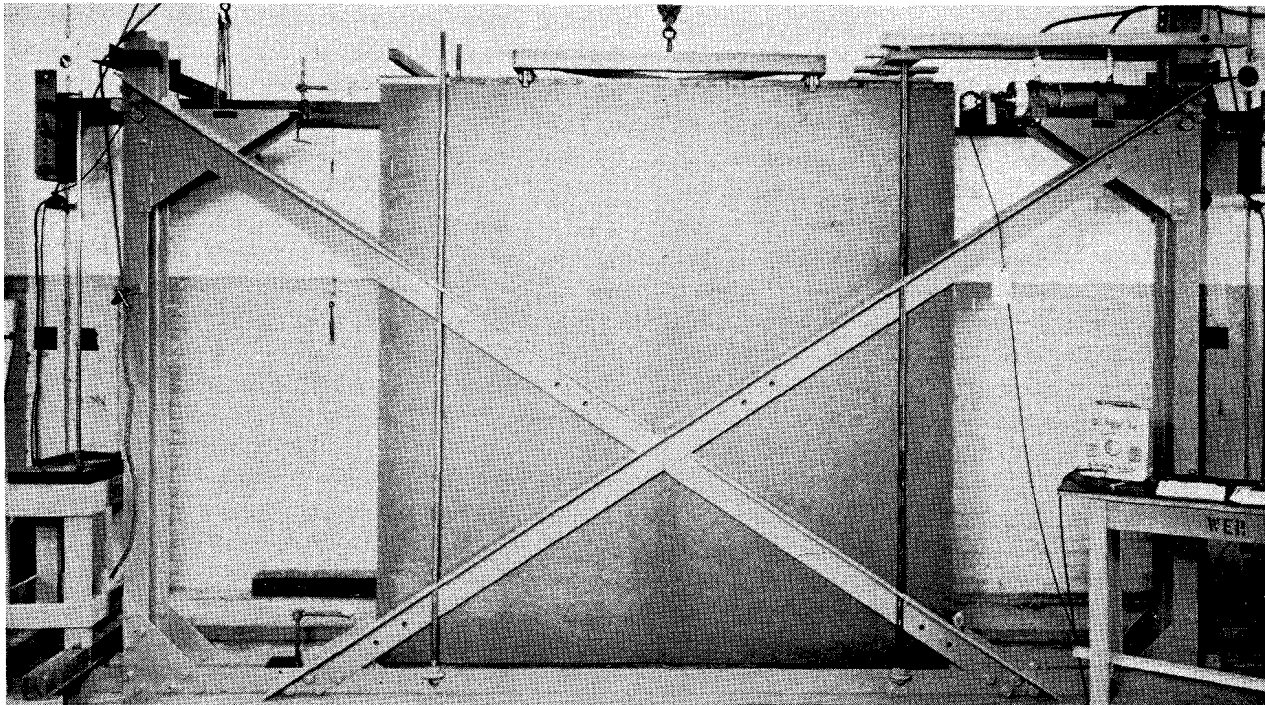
Fixed steel frame used to test 8- by 8-foot panels in racking.
